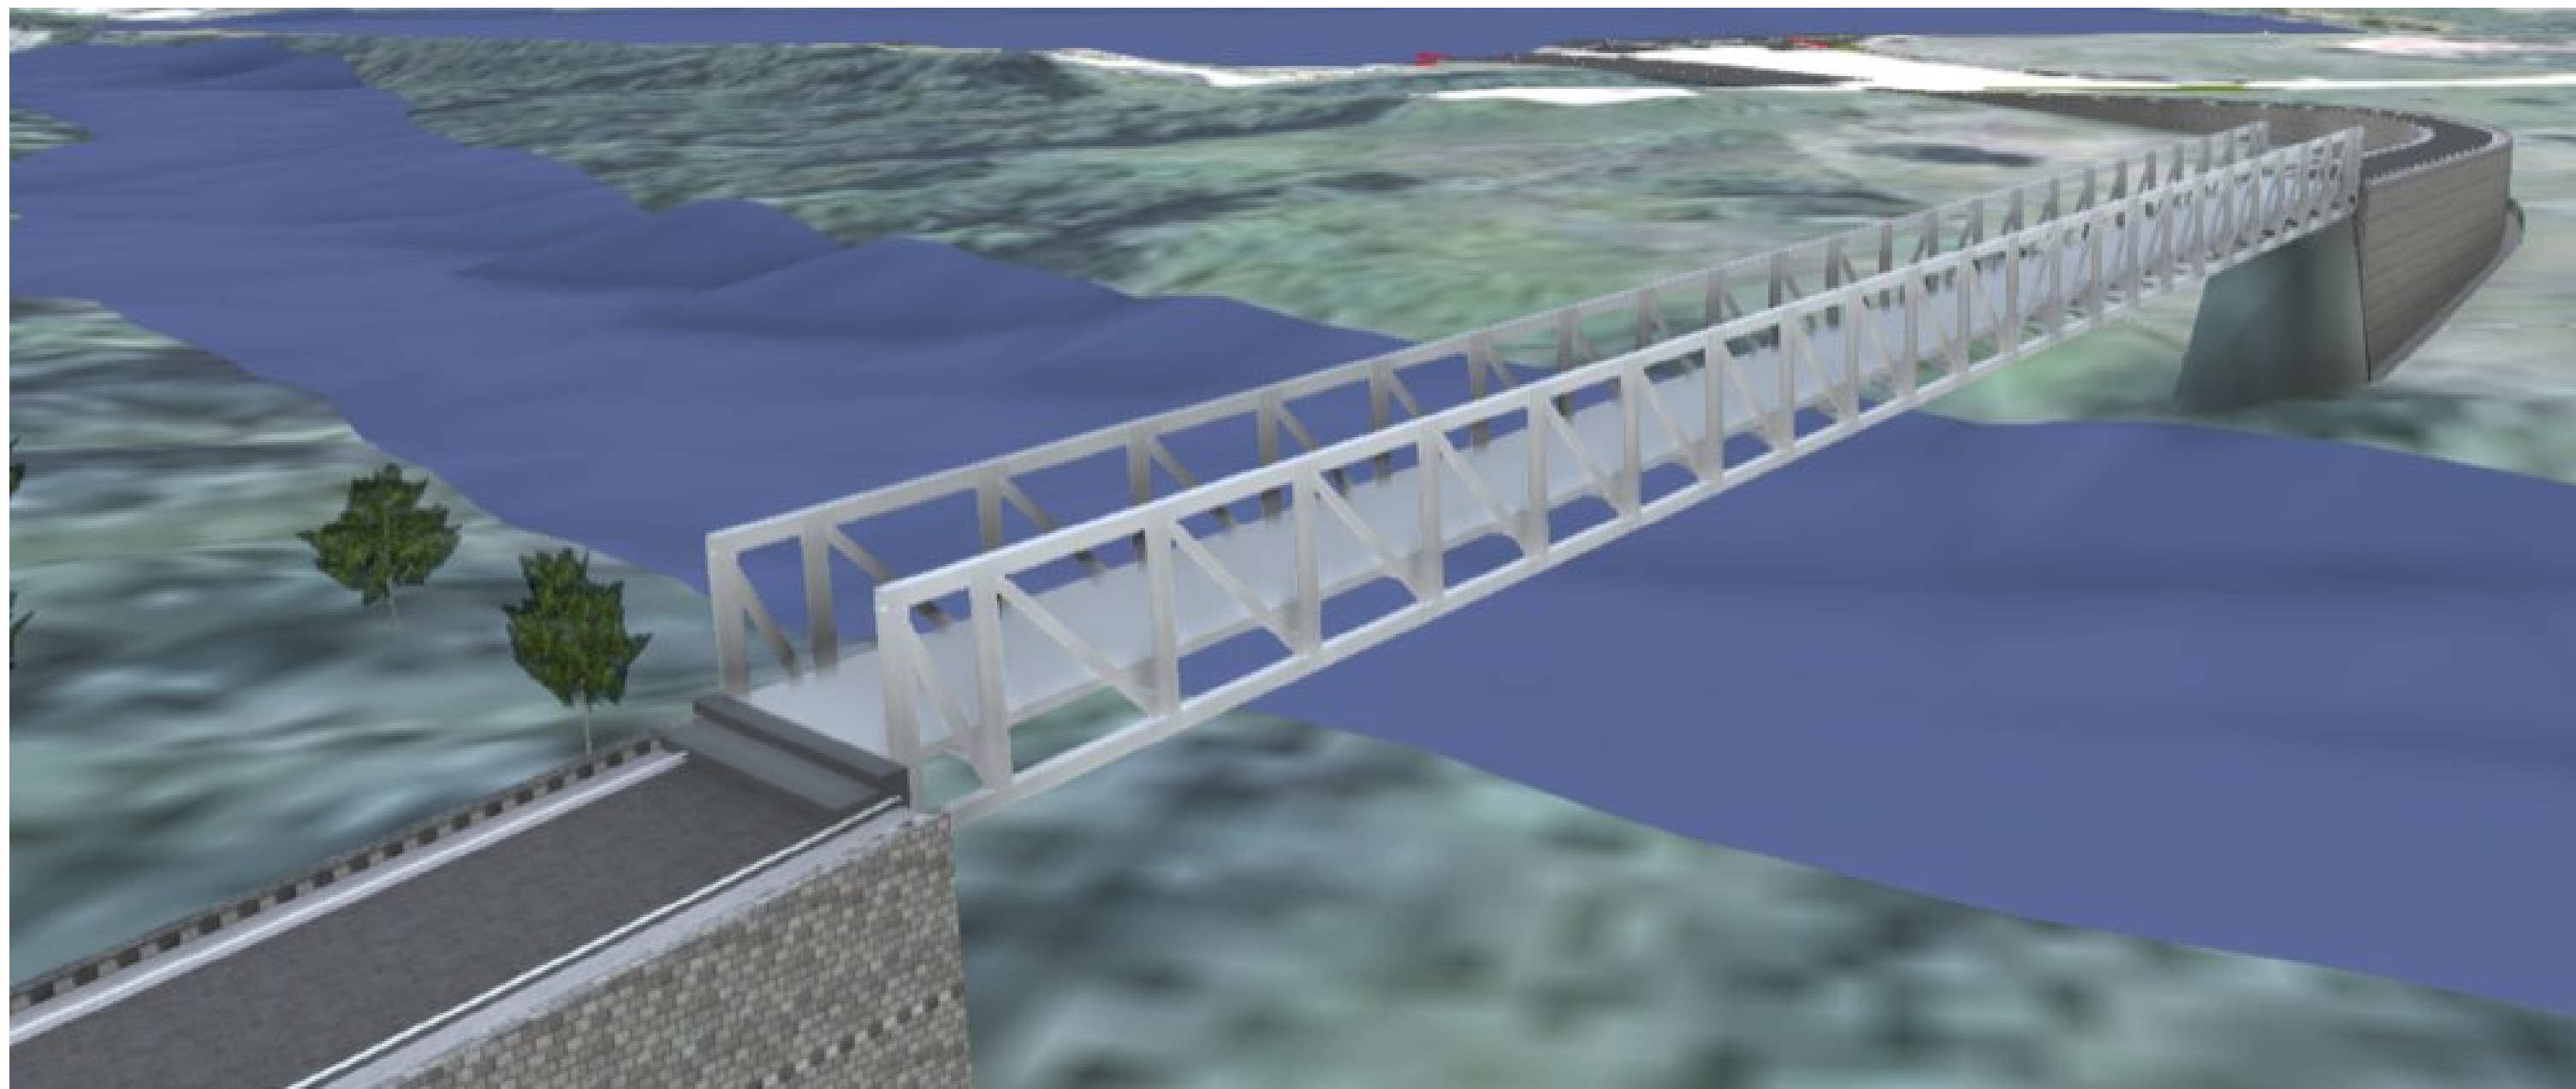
A 184-foot bridge attached to 1545 feet of trail connects Schram Park to S. Brewer street
